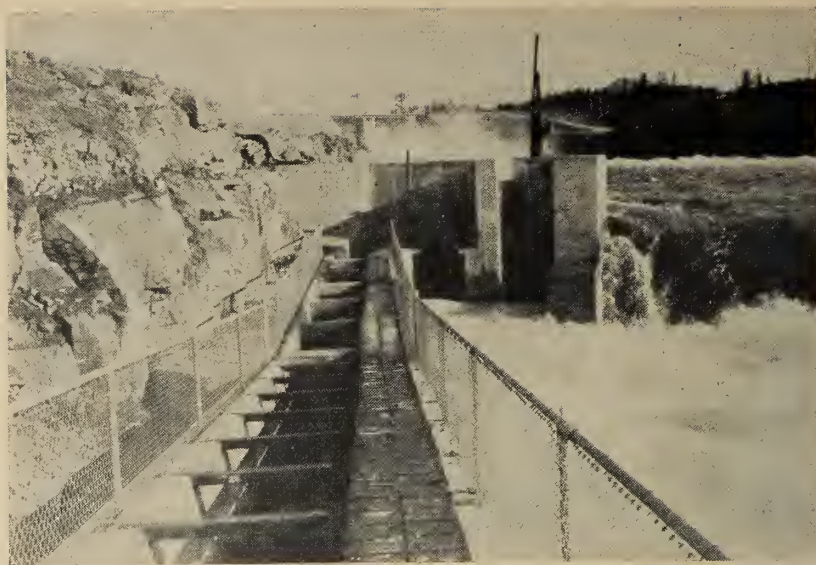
Barrier Dam and downstream end of the Fish Ladder looking upstream.
